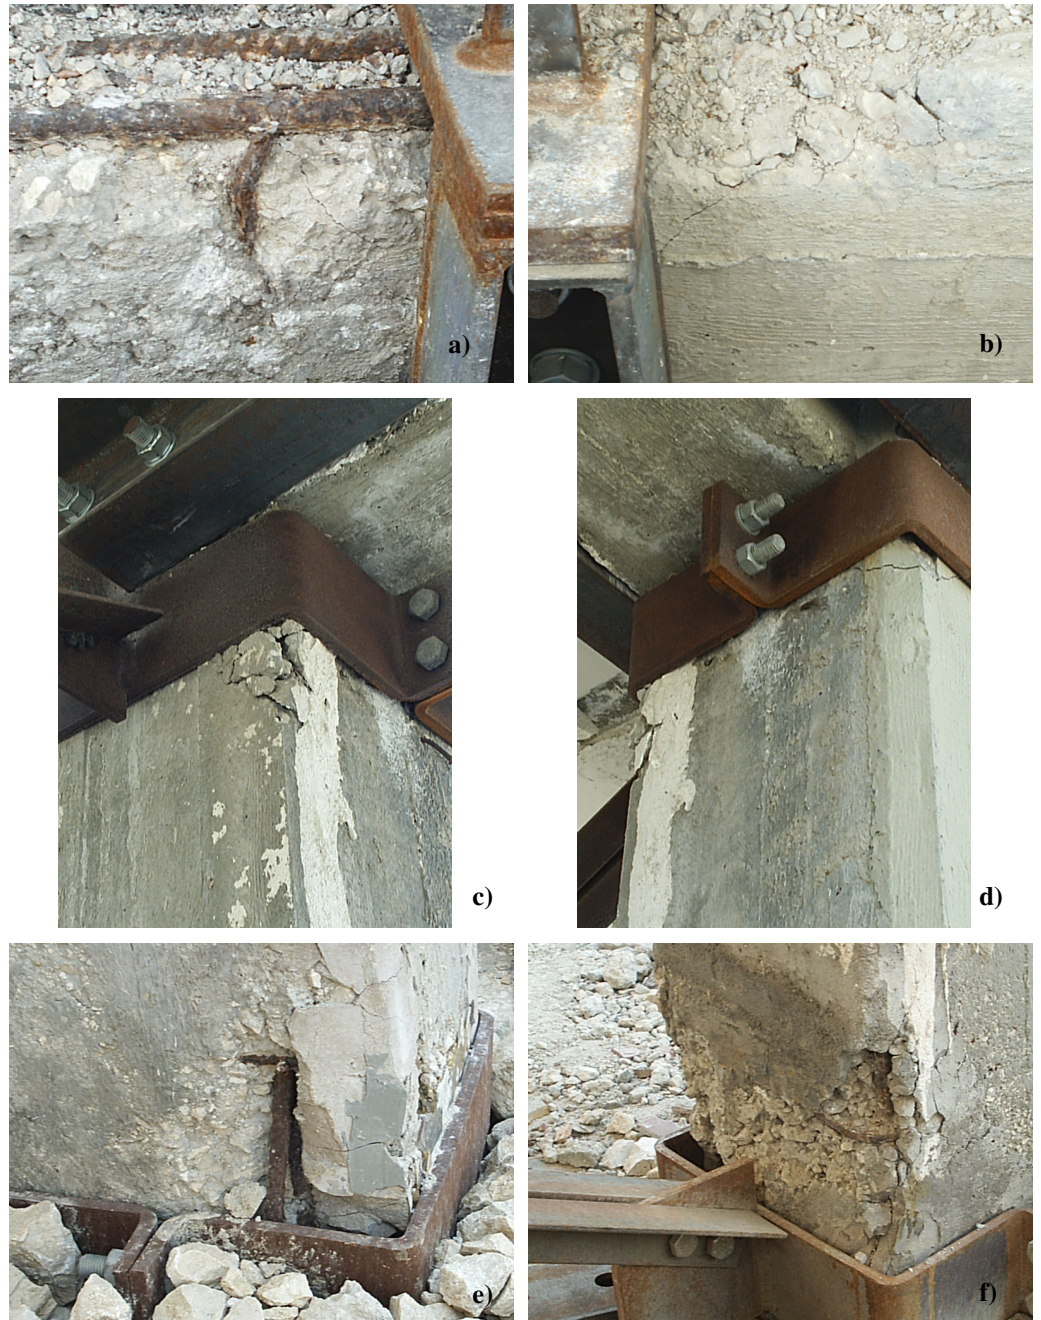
Damages occurred in the RC structure members at the test end: foundation beam (a, b) and top (c, d) and bottom (e, f) zones of columns
